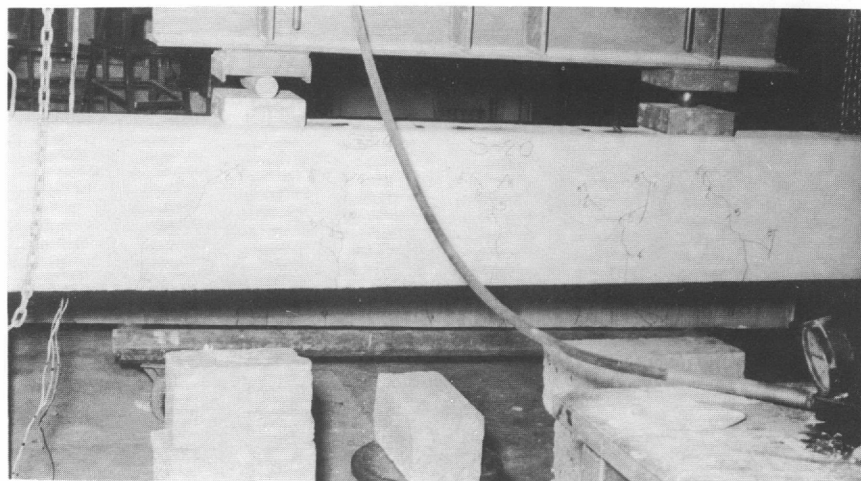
VIEWS OF BEAMS AFTER TESTING
